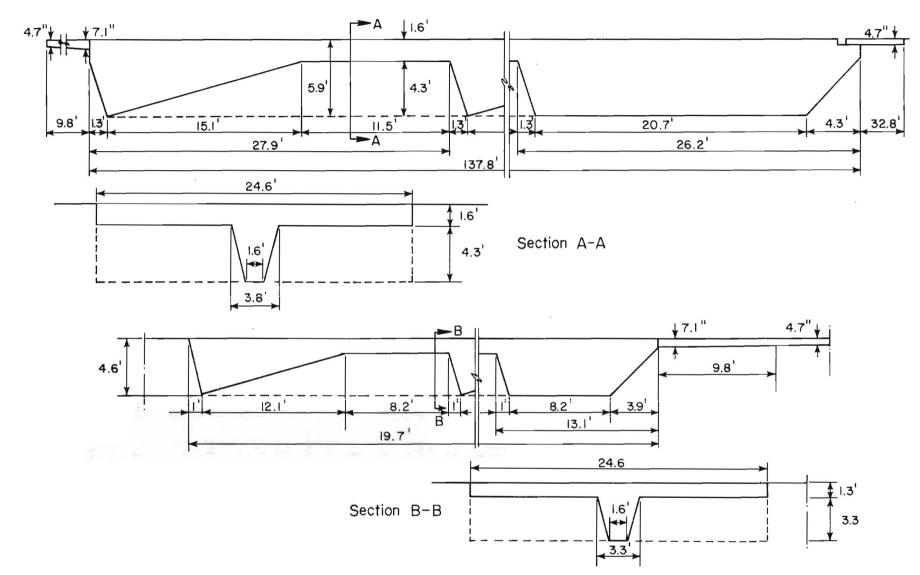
ABUTMENTS FOR TEST ROAD AT FONTENAY-TRESIGNY, FRANCE
